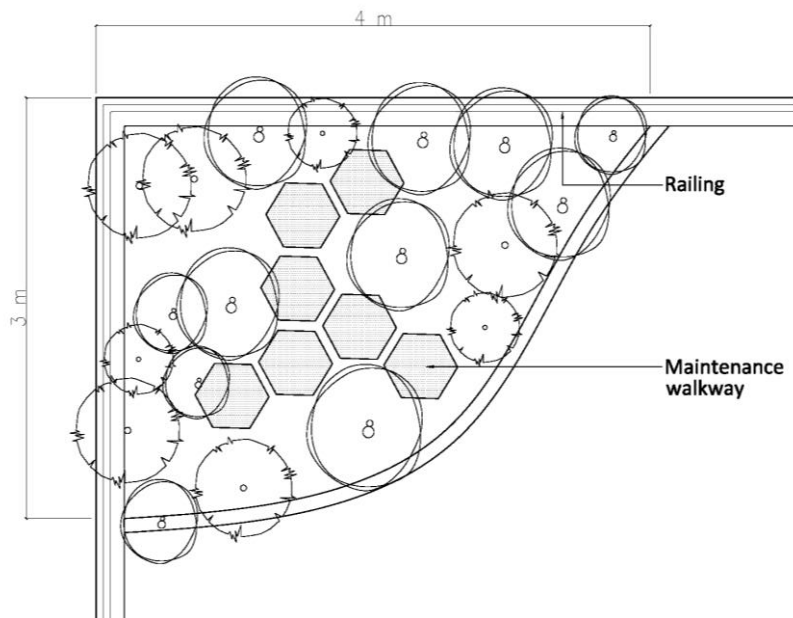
Maintenance walkway for planter box more than 1.8m wide
